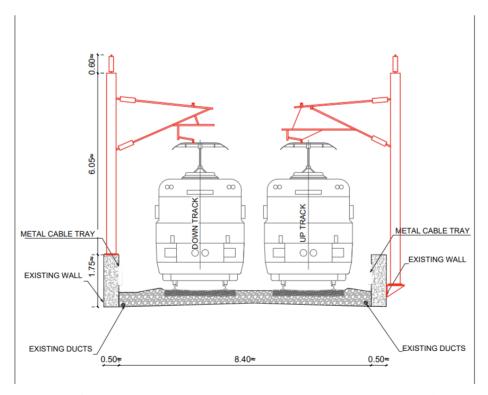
Extract from General Arrangement Drawing showing track cross section with poles.
